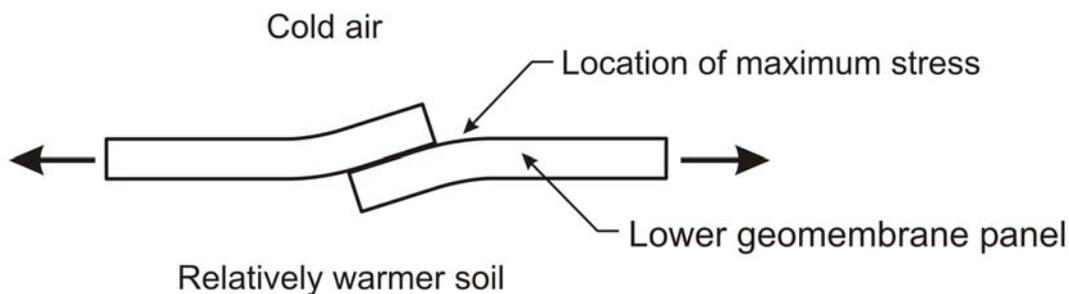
Cross section of the geomembrane subjected to tensile forces and exposed to cold air on its upper face, showing the location of maximum tensile stress, which occurs in the lower geomembrane section.
